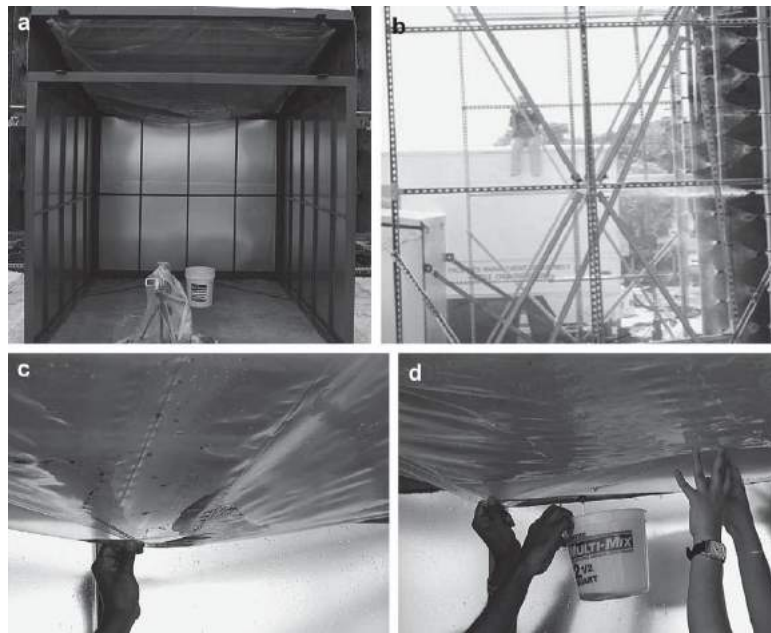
Water monitoring and collection setup: (a) Complete setup with camera and plastic ceiling, (b) the SWB test specimen from bird's view and (c) leaked water through the roof layer and (d) water collection (after Bitsuamlak et al., 2009).
